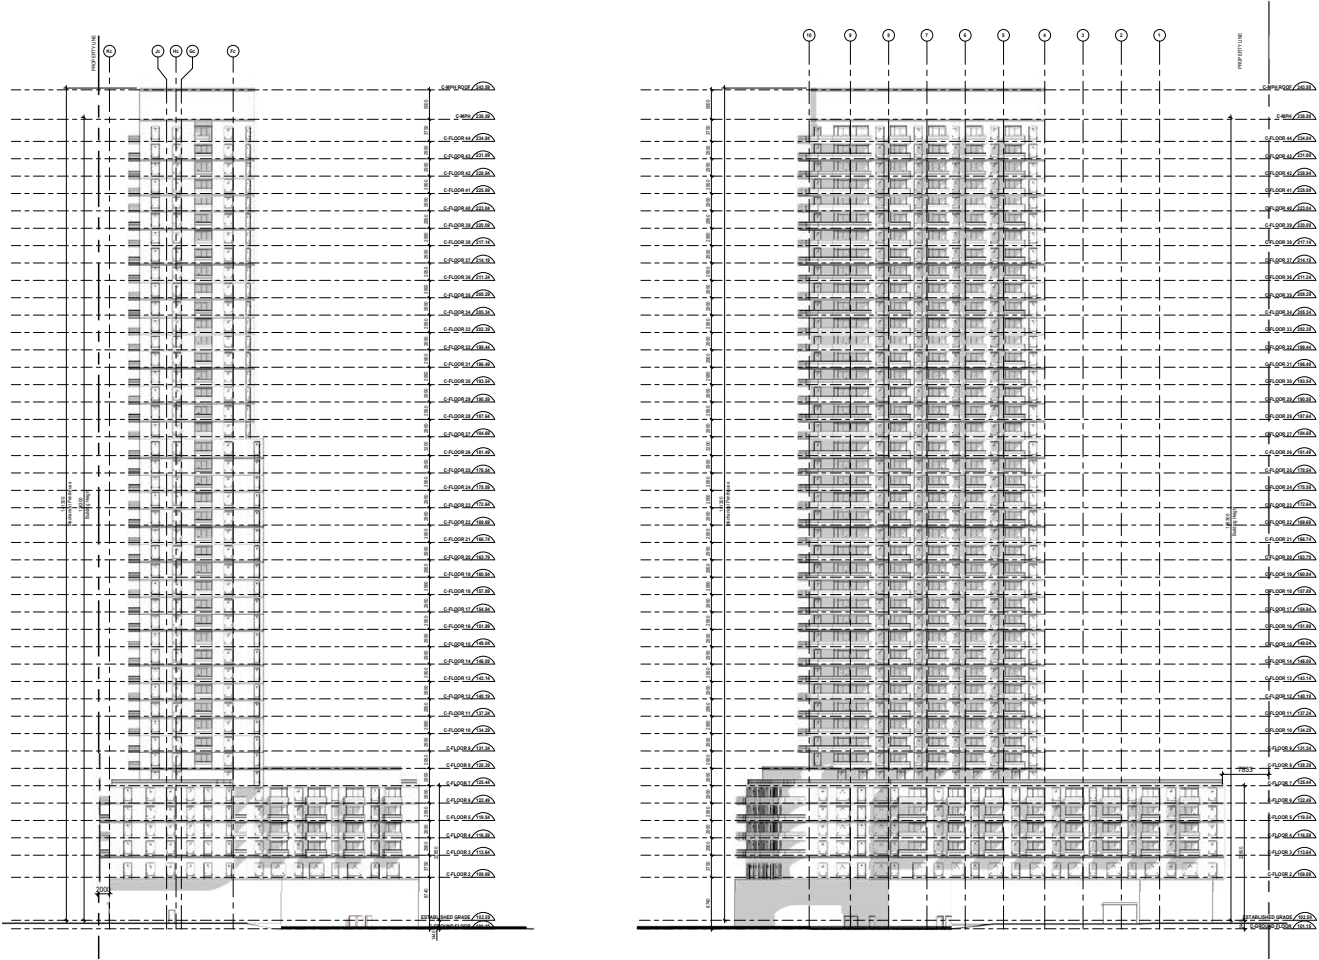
South and West Elevations - Building 2 (Provided by BDP Quadrangle)
